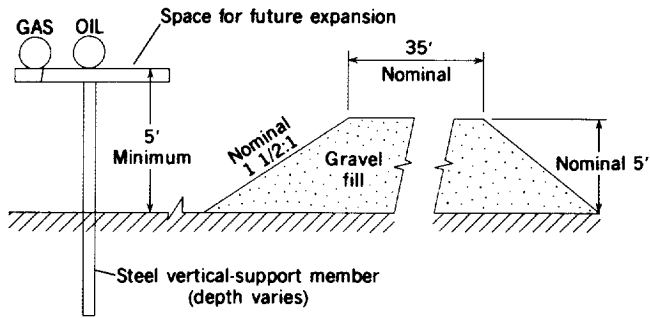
Typical cross section of pipeline and road development. No scale.
